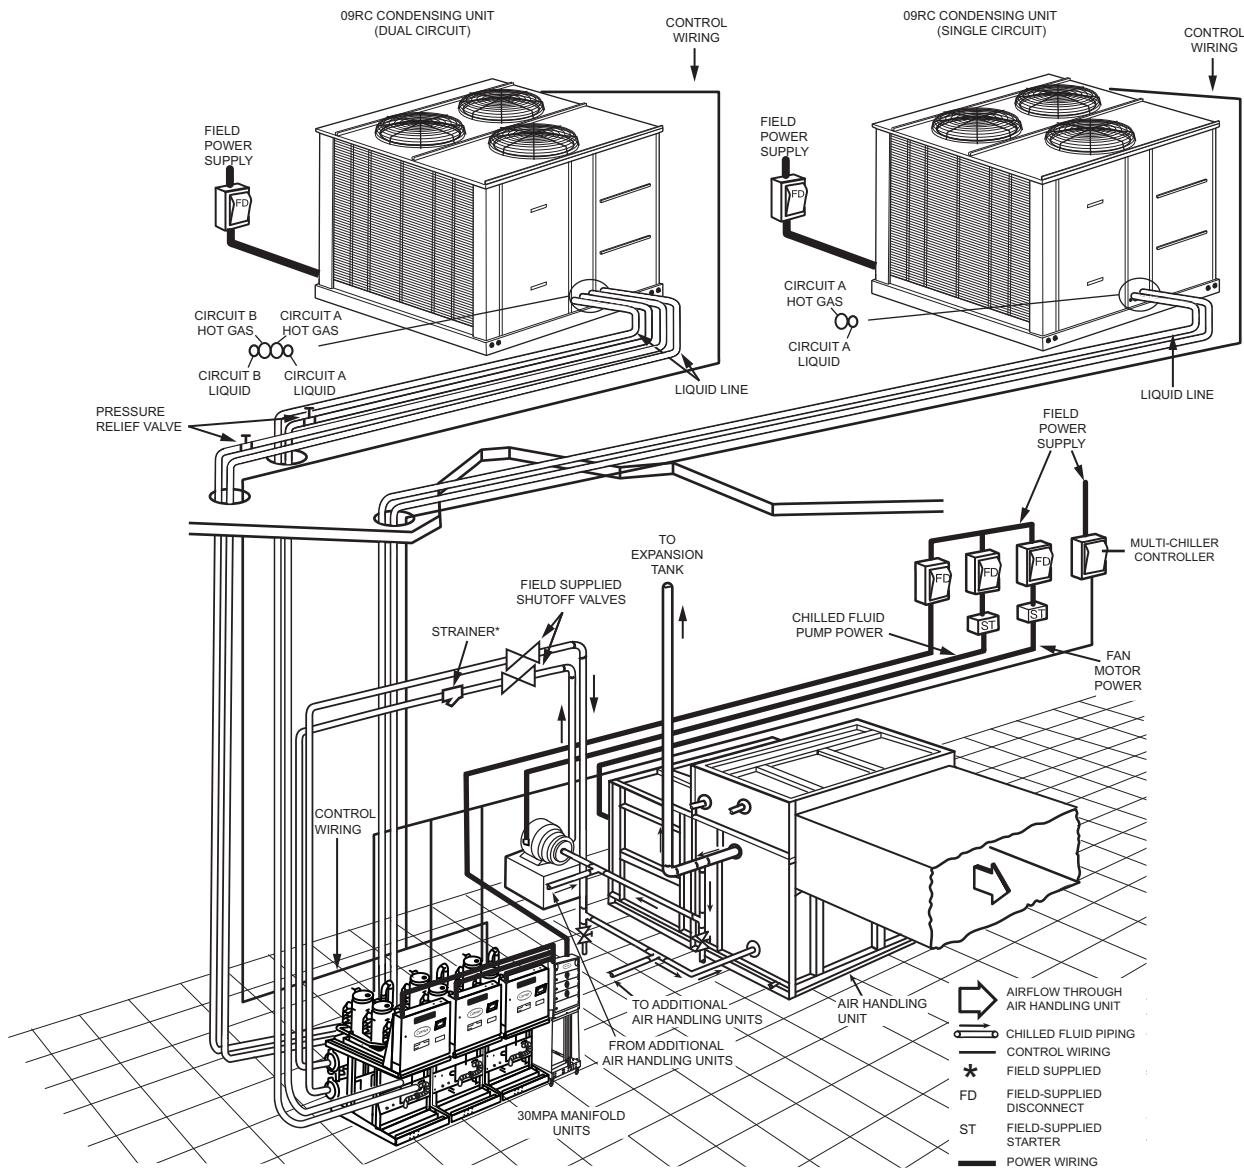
30MPA Typical Piping and Wiring Connections
